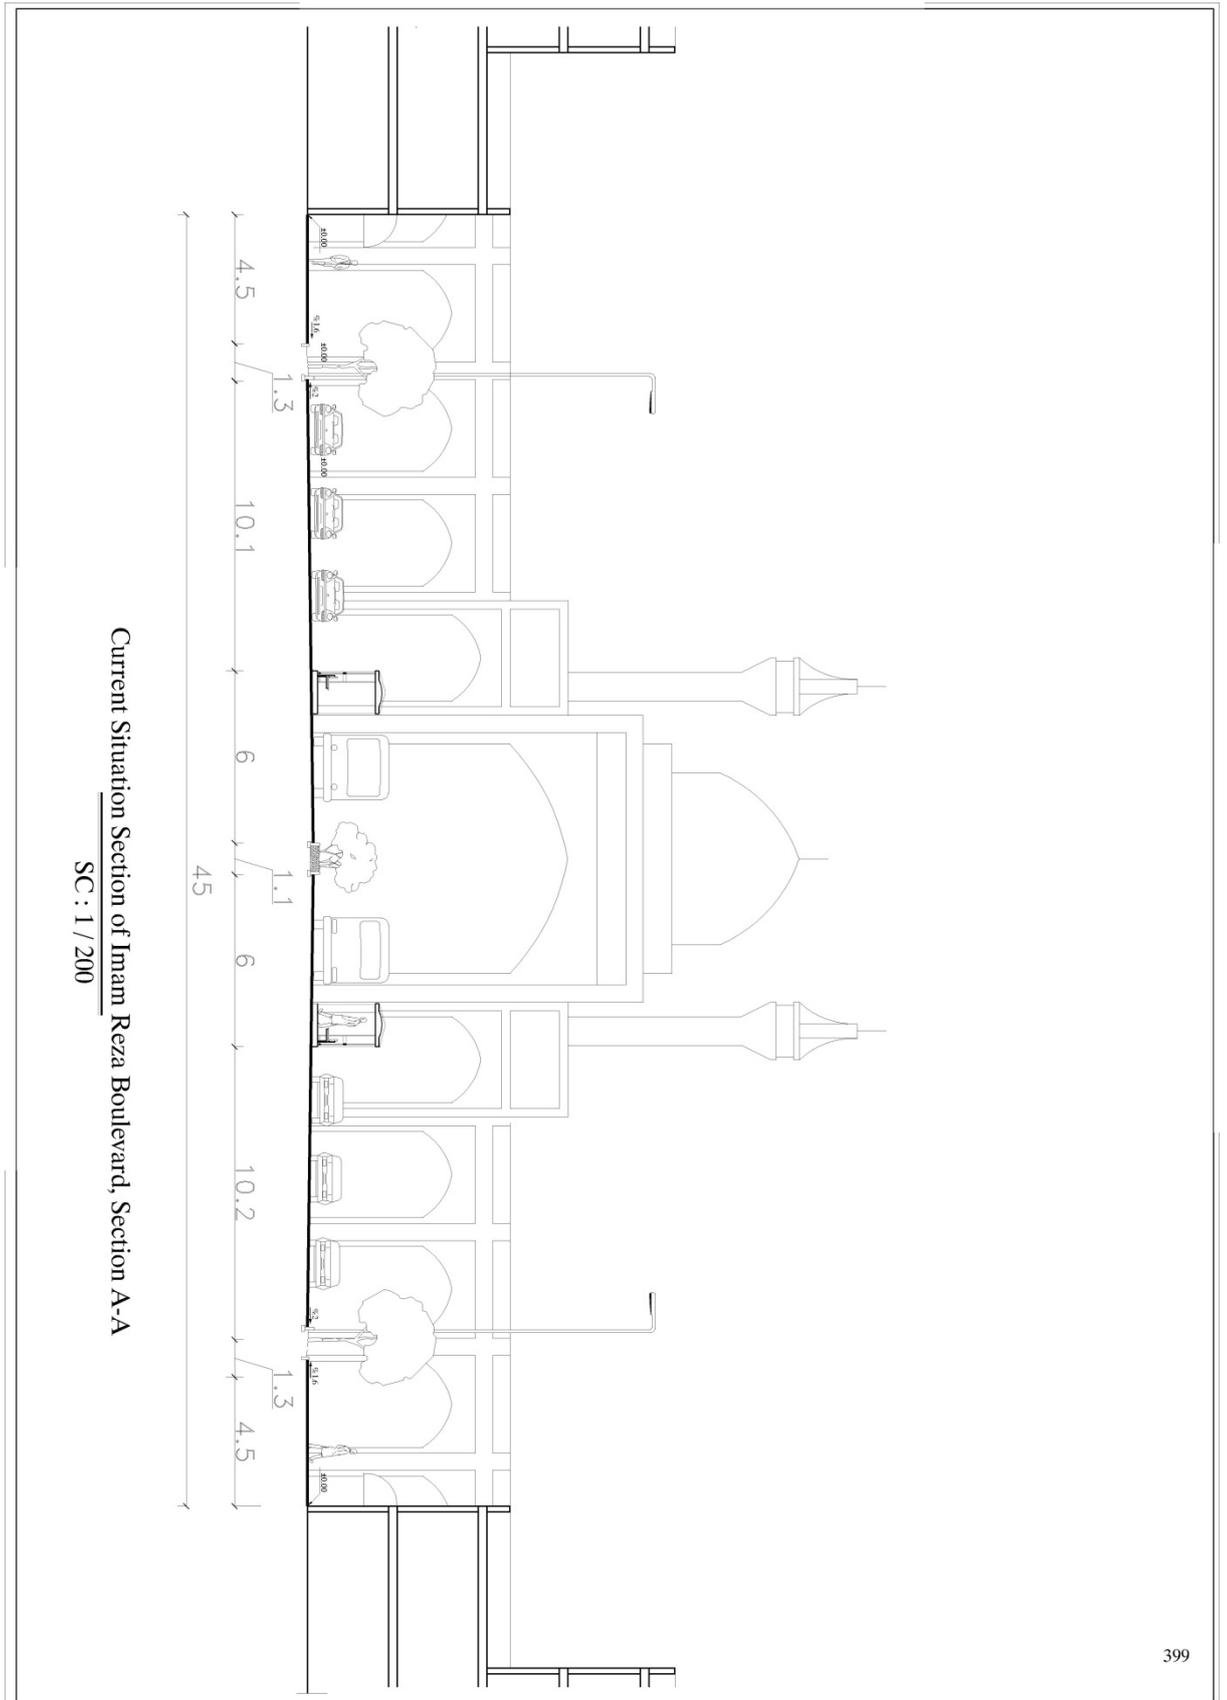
Section of Imam Reza Street, Section A-A. (Author)
